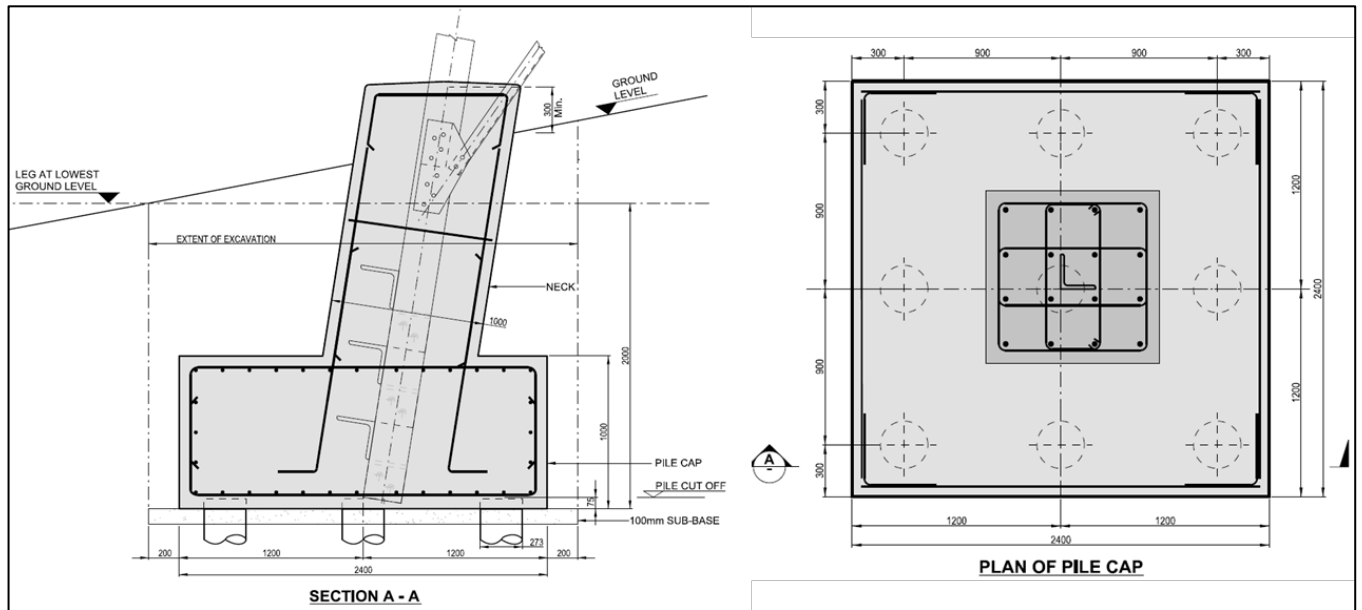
Typical Piled Intermediate Tower Leg: Foundation (dimensions subject to site specific design)
